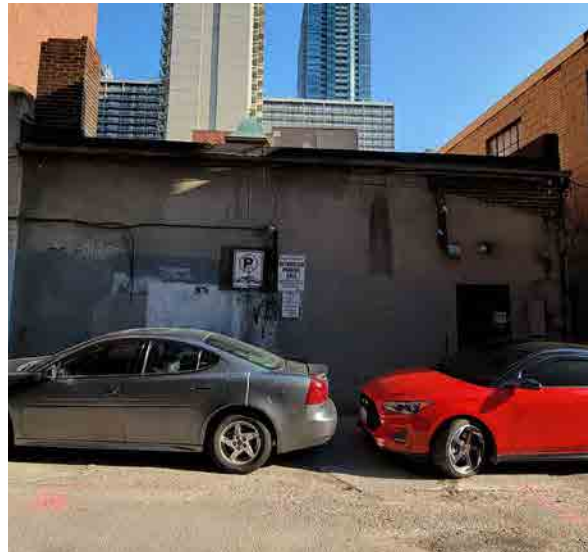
Chimney and corner brickwork are in poor condition (ERA, 2022).
